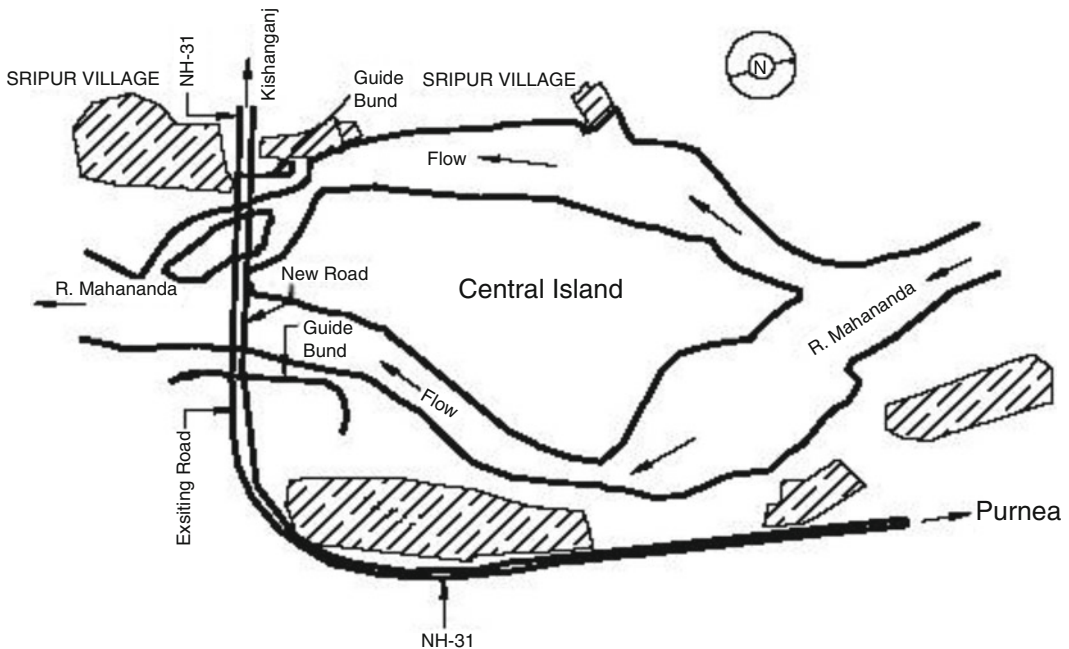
Plan showing anabranching of river Mahananda u/s of bridge on NH-31
